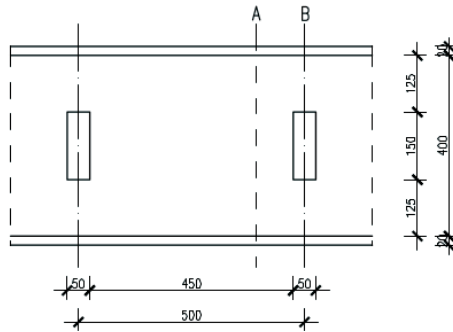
The cross-section of a wall made of a mix formed in the formwork
